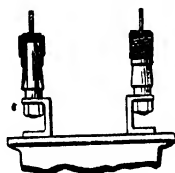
Method of Mounting Block Wires in Line on Telpher System (end elevation).
